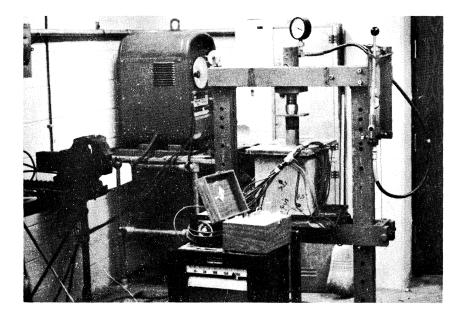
Model of bearing assembly as prepared for welding.
